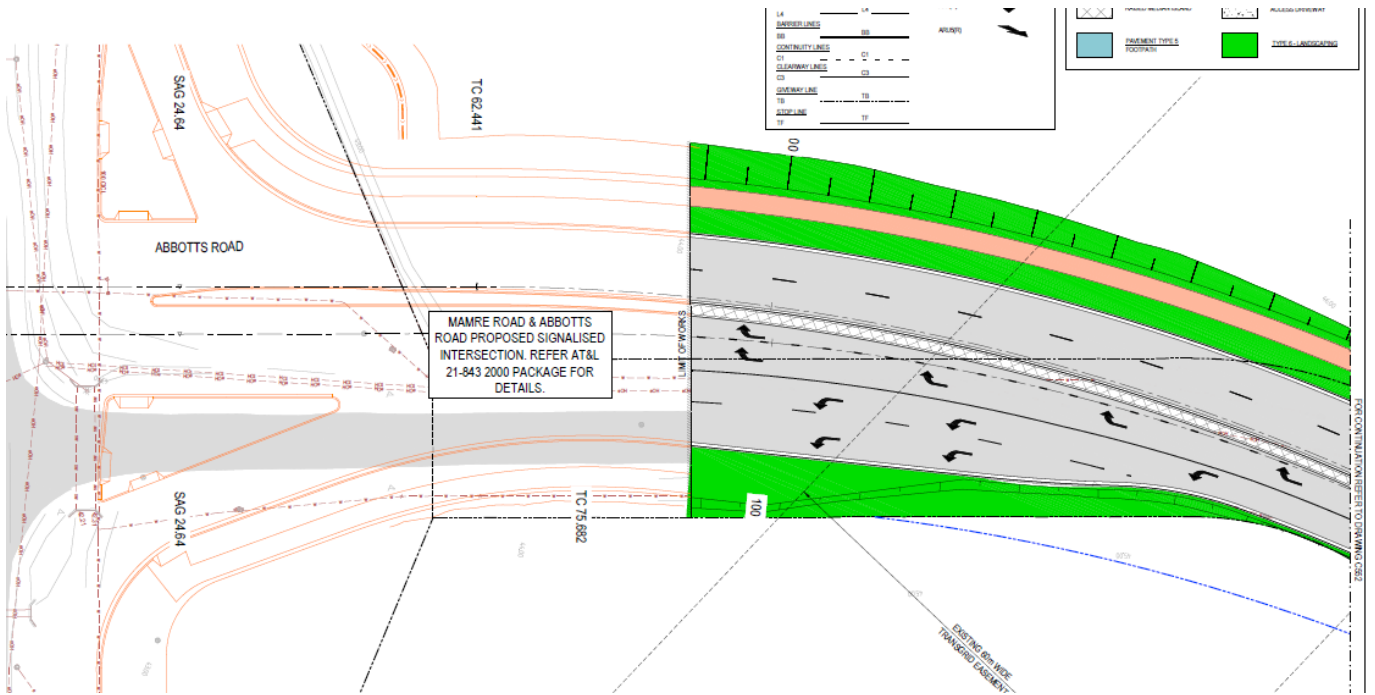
Abbotts Road when approaching the Mamre Road Intersection
